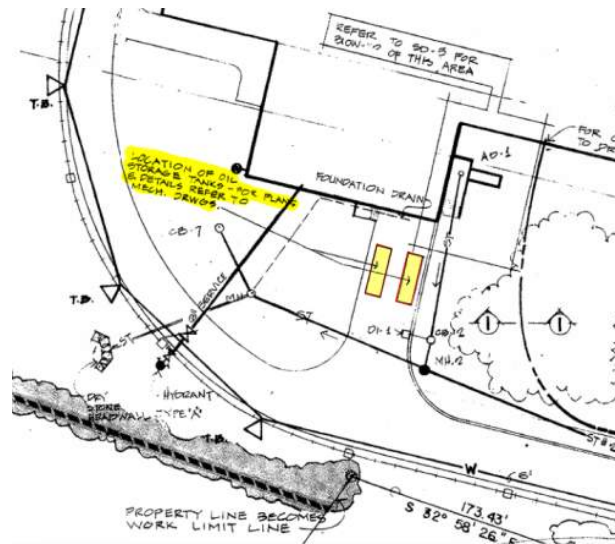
1971 Utility Plan, Underground Oil Tanks
